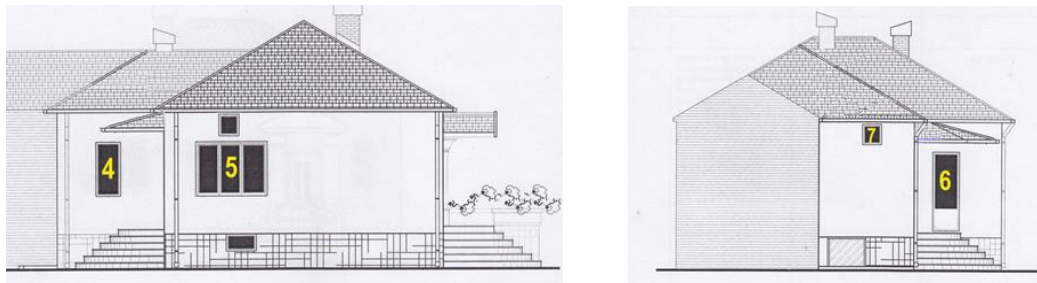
a) South-eastern facade of Building 1 at CP-1831 b) South-western facade of Building 1 at CP-1831
